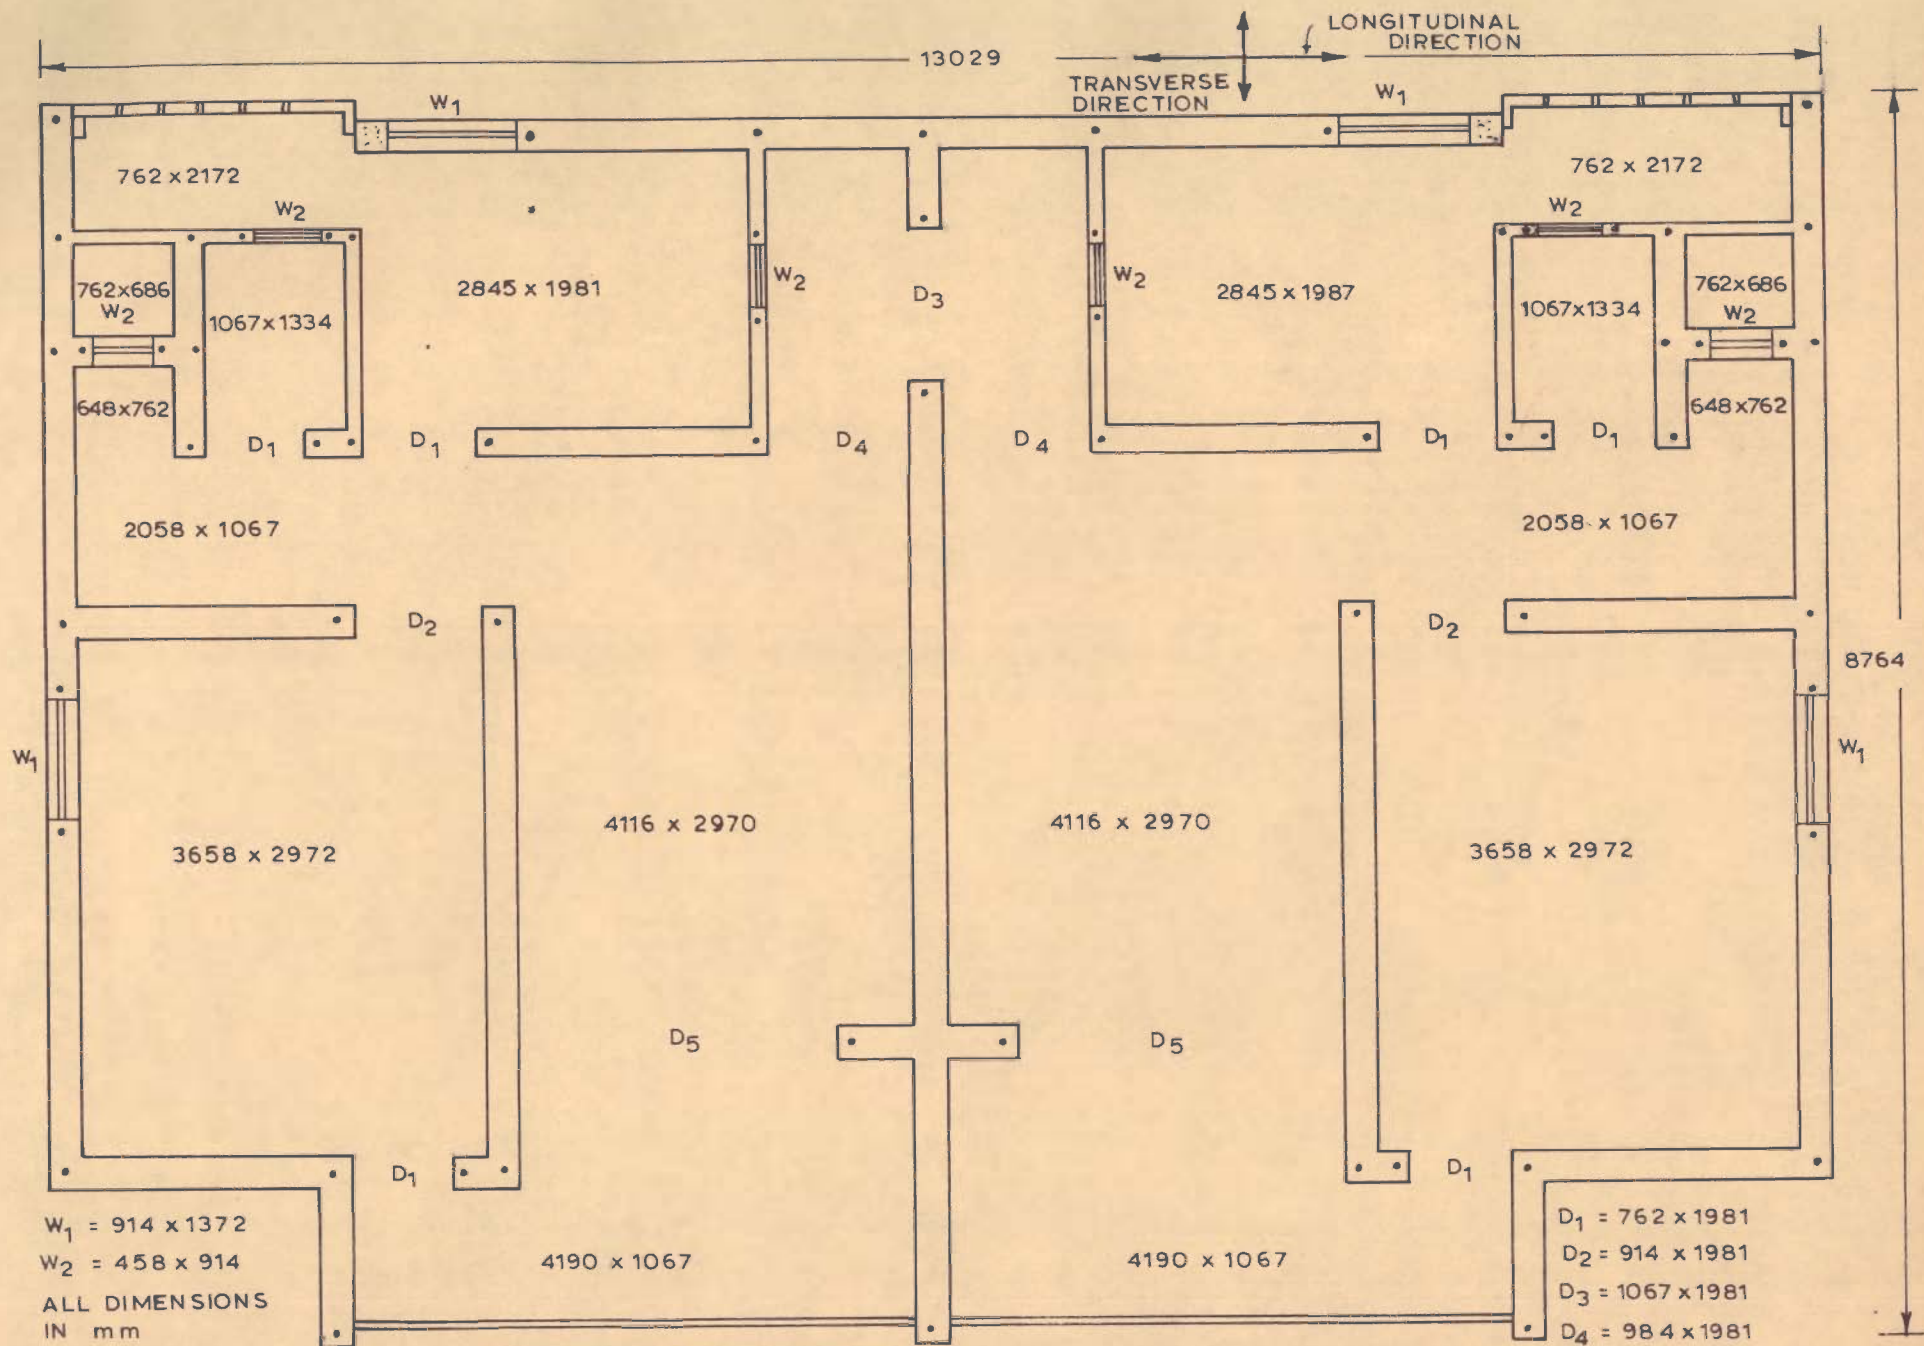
TYPICAL PLAN AT GROUND AND OTHER FLOORS OF A MULTISTOREYED BRICK BUILDING (Main walls 1-brick thick)
